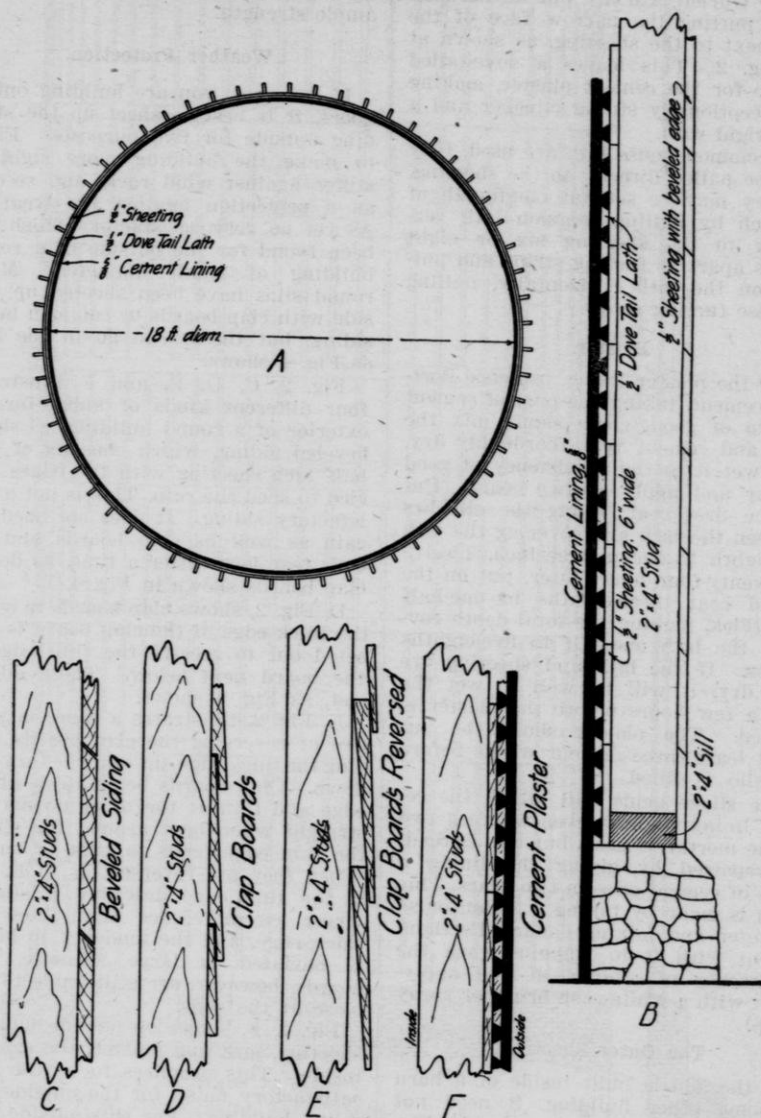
Details of construction of Gurler silo. A is ground plan; B, vertical section of wall showing cement plaster lining inside and beveled siding outside; C, D, E and F show different types of outer section; D, clap boards; E, clap boards reversed; F, lath and plaster outside.
